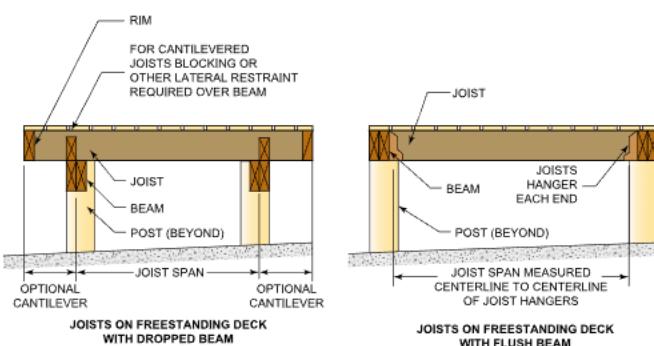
TYPICAL DECK JOIST SPANS
